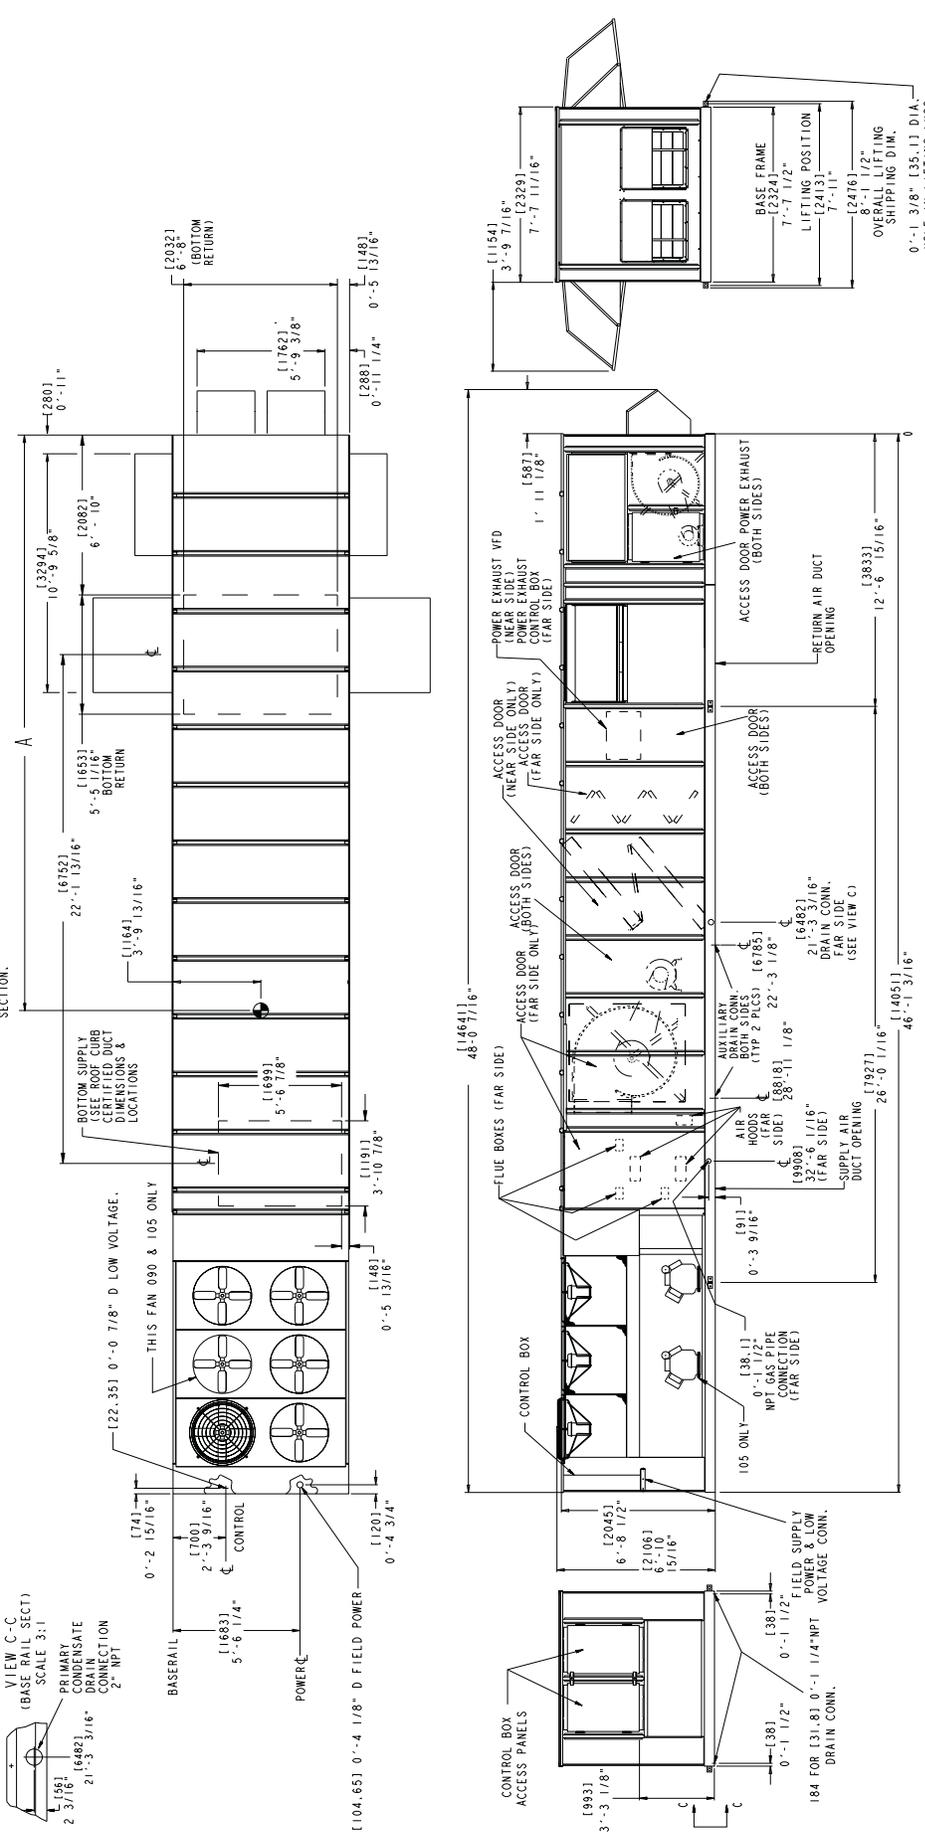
Base Unit Dimensional Drawing — 48ZT, ZW075-105 (Units with High-Capacity Power Exhaust)
